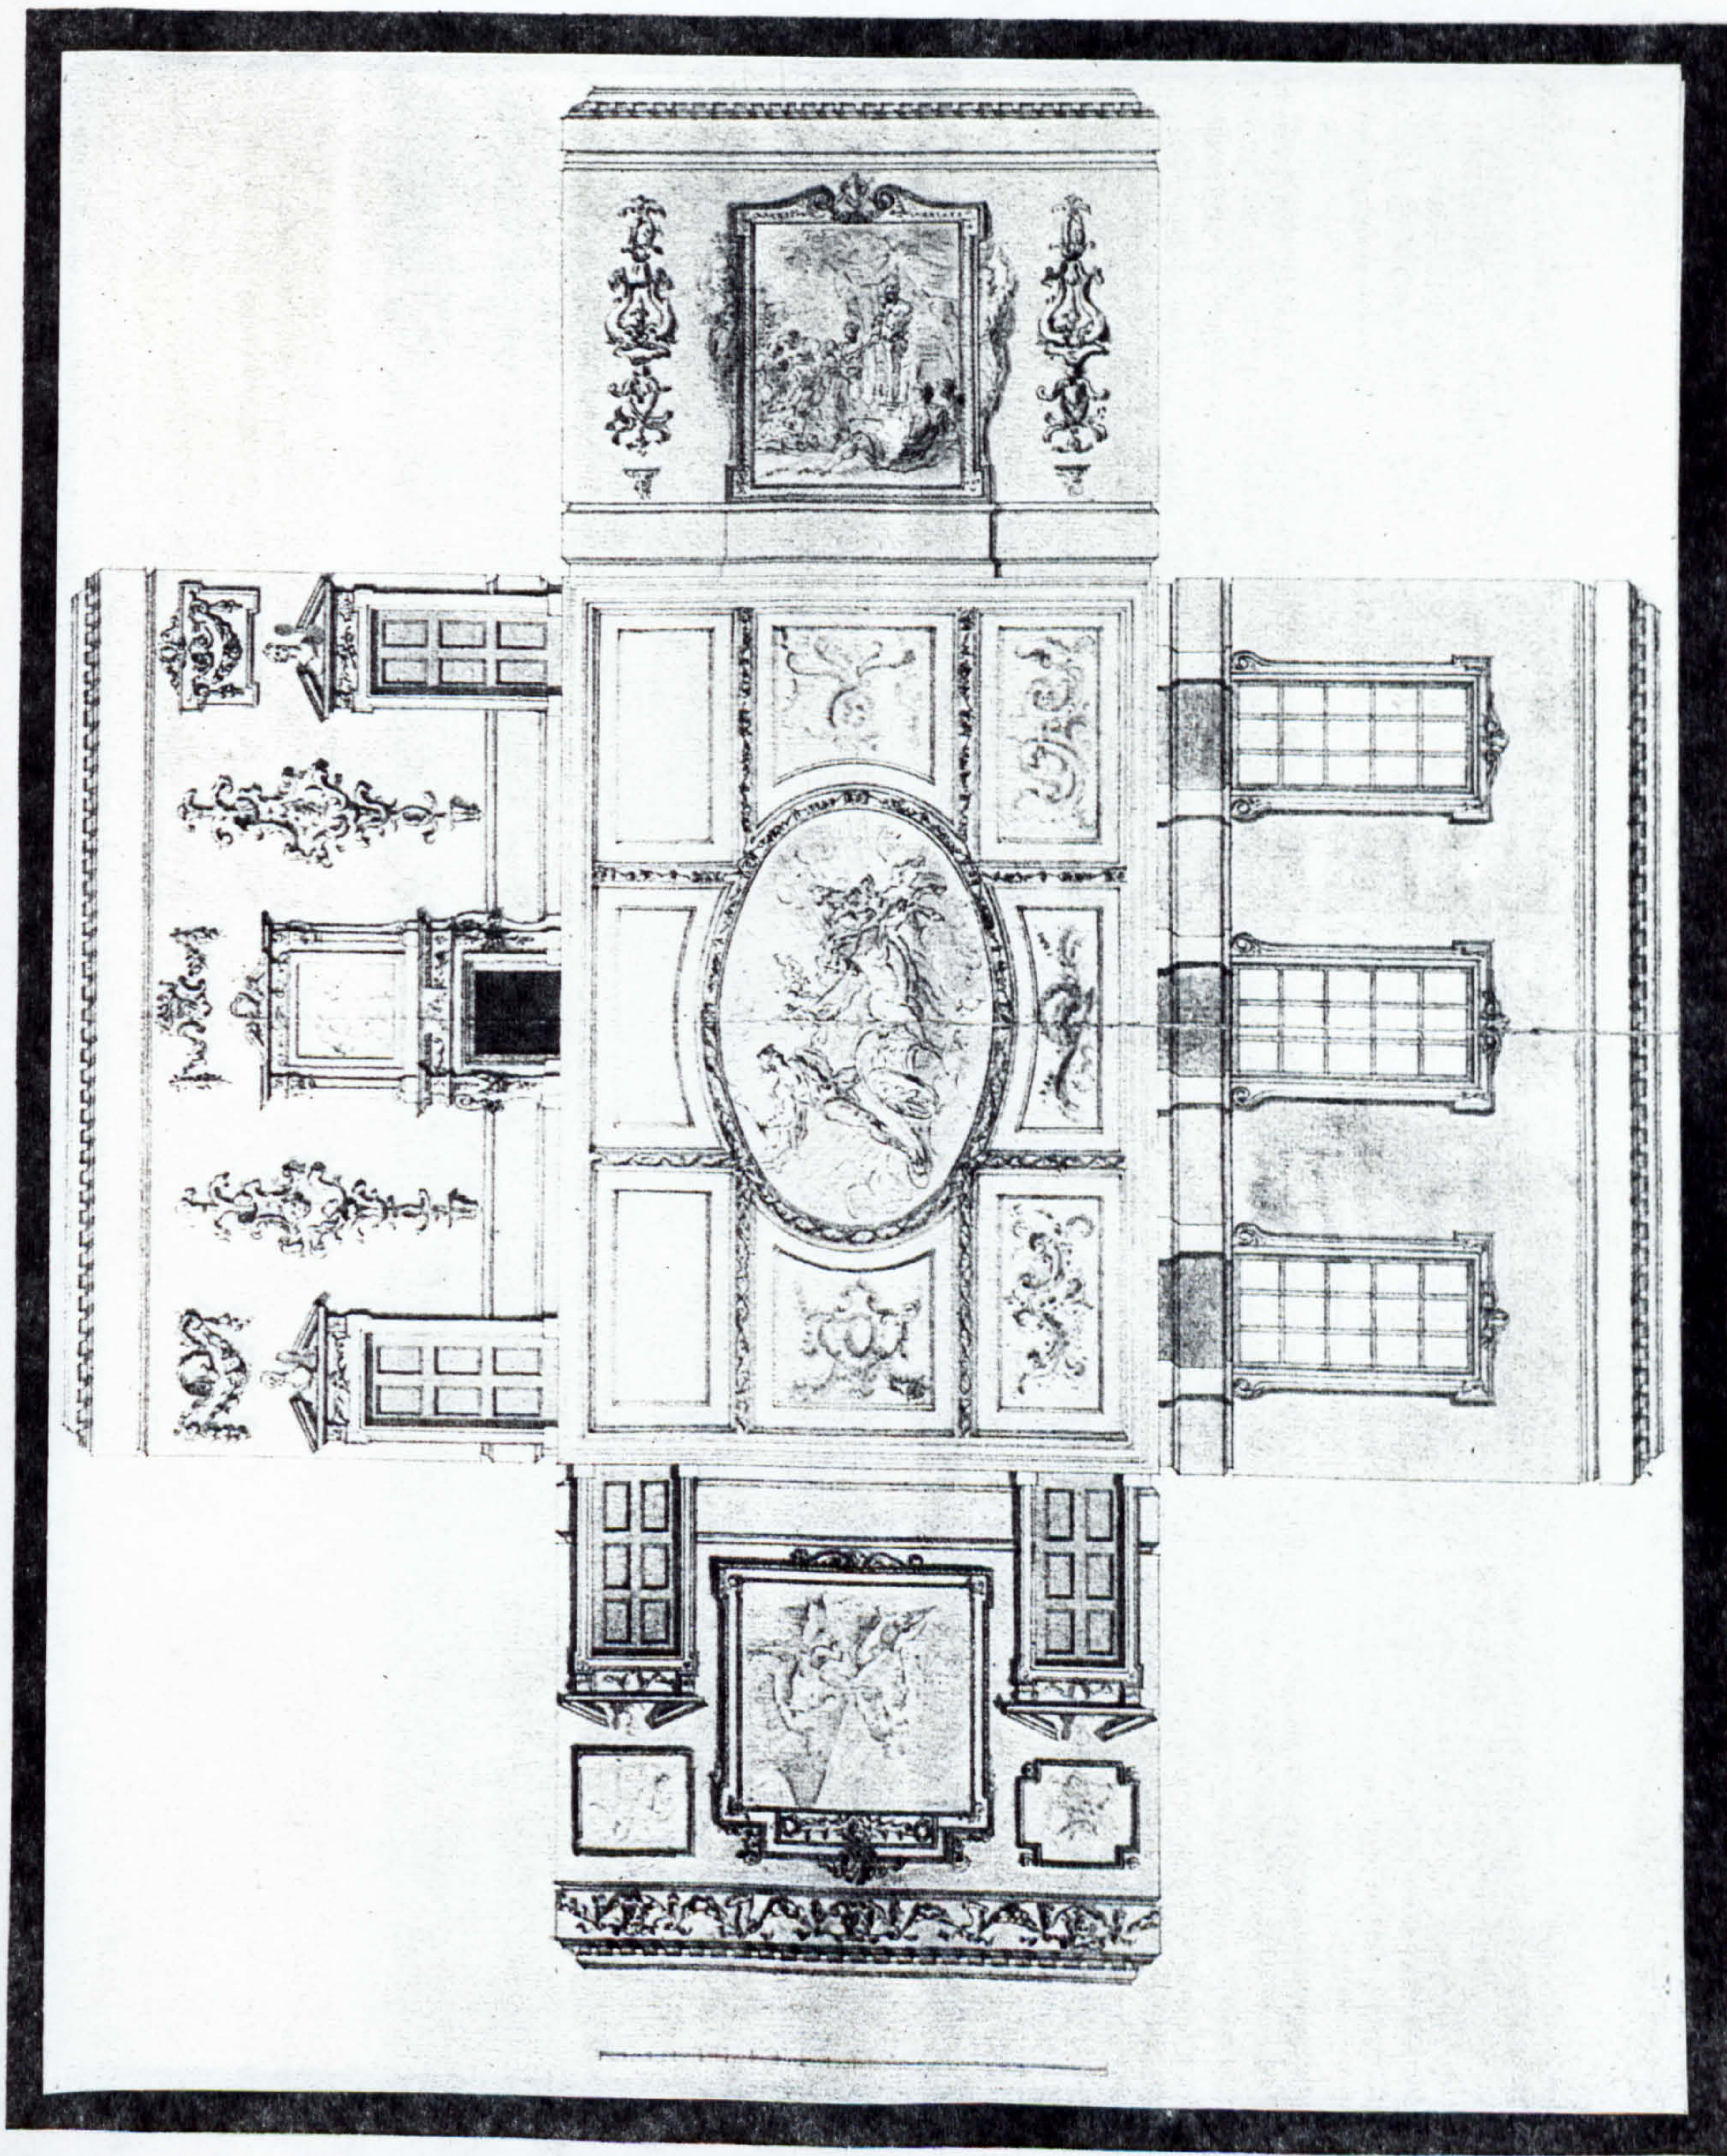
DESIGN FOR THE DINING ROOM · KIRTLINGTON PARK · c. 1745
